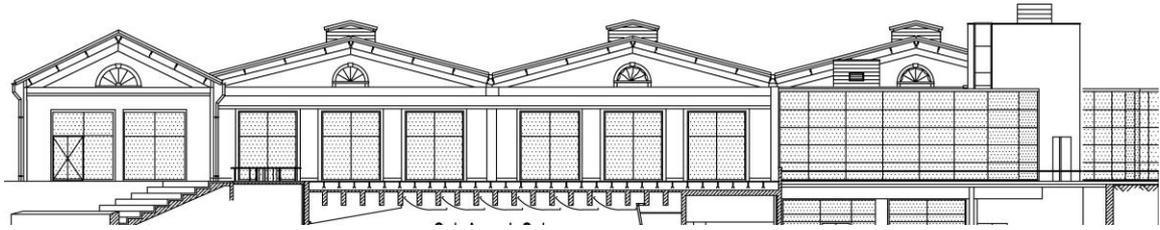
Front facade of CerModern, hangar building on the left, ateliers in the middle and the annex building on the right. (Source: Uygur Mimarlık Archive)
